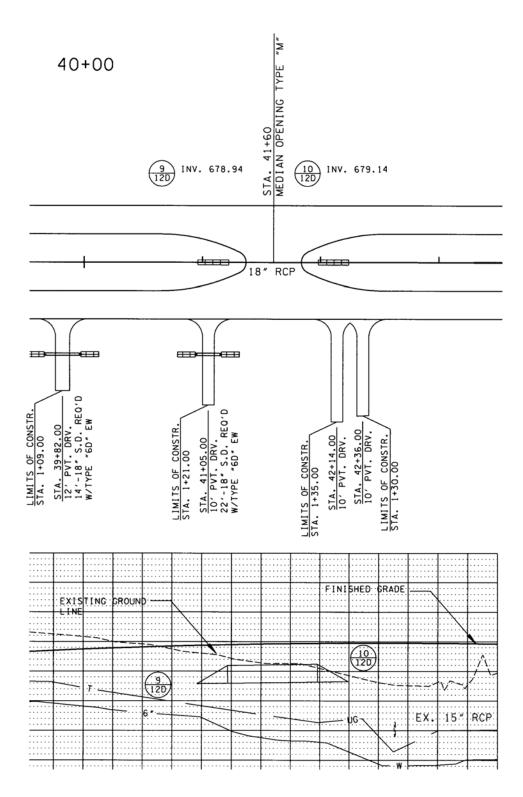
A-12. Portion of Proposed Layout Sheet (Median Culvert)
